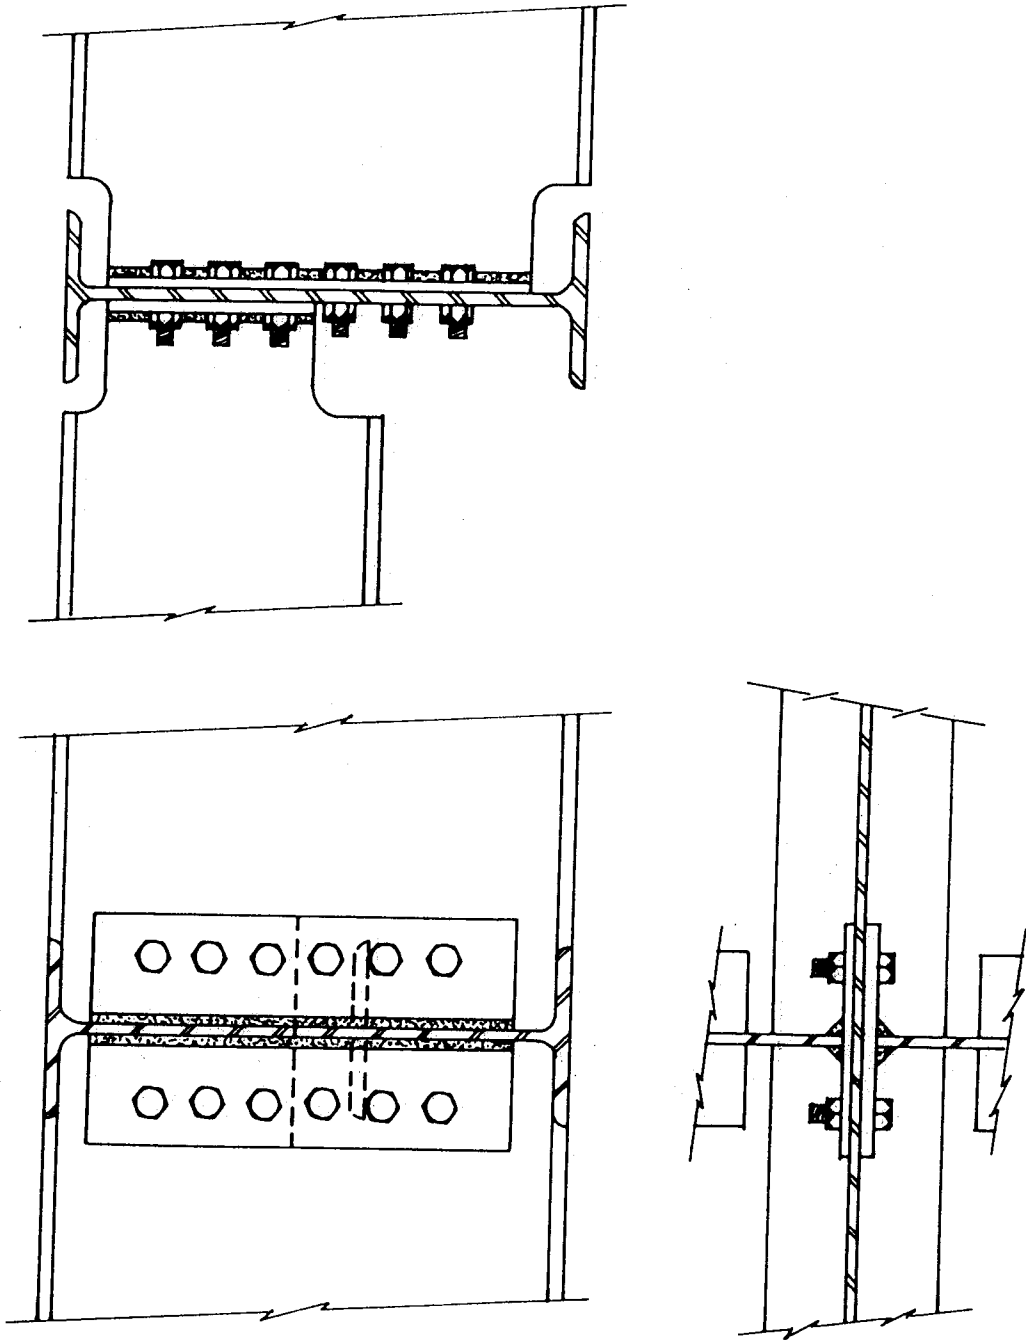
Double Flexible End Plate Connection to Beam Web Detail
